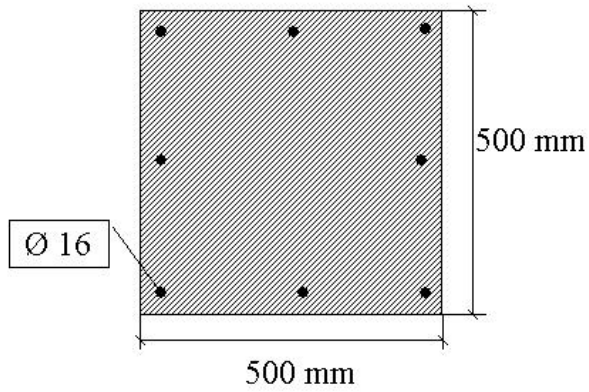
Reinforcement detail of a typical square column. (from Bostenaru, 2004)
